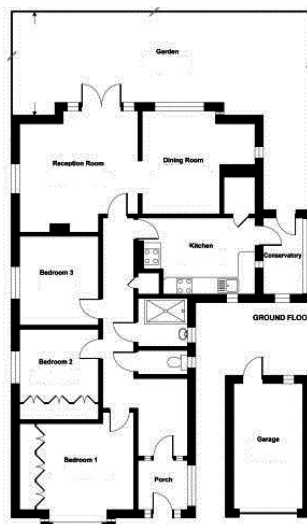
Floor plan of No.3 Crofton Lane (Credit from Rightmove)
